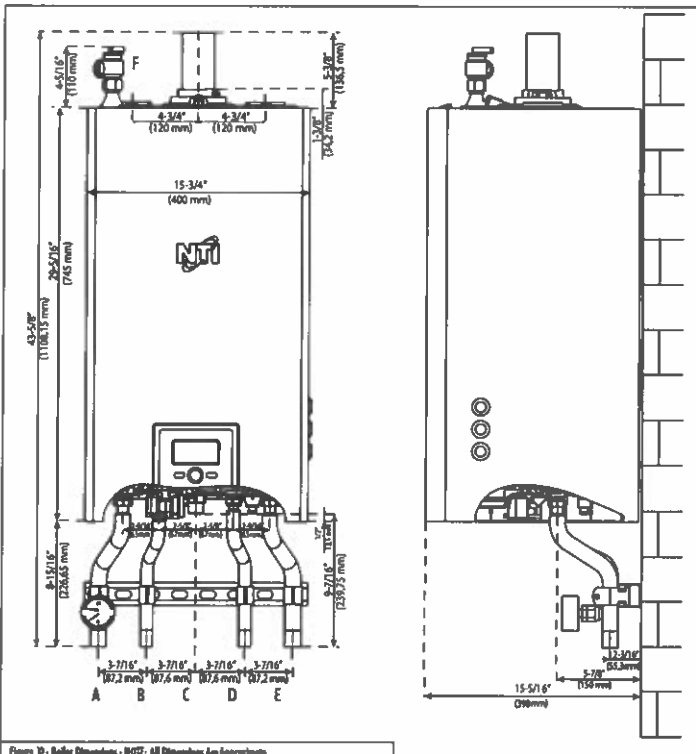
Boiler Dimensions - NOTE: All Dimensions Are Approximate
